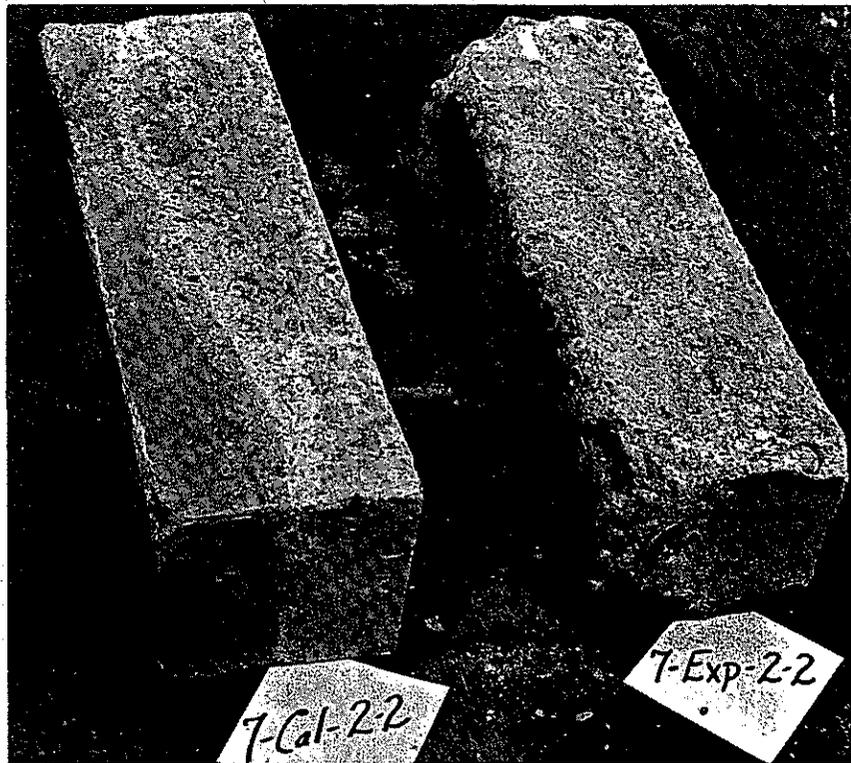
7-sack concrete after 18 months exposure. Type II cement left; shrinkage compensated cement right.
